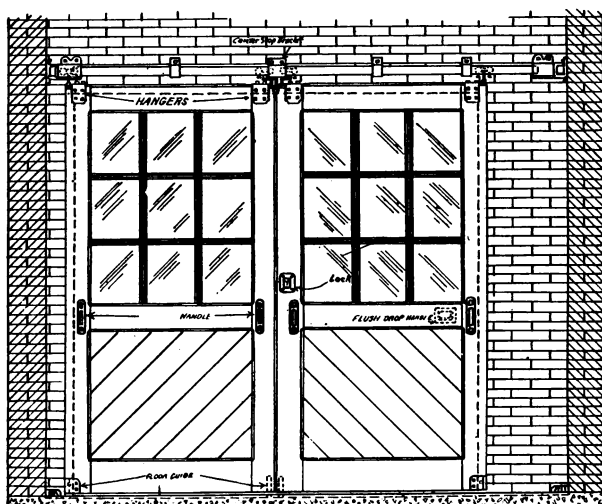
Inside Elevation of Double Doors Equipped with a Complete Set of Hardware
